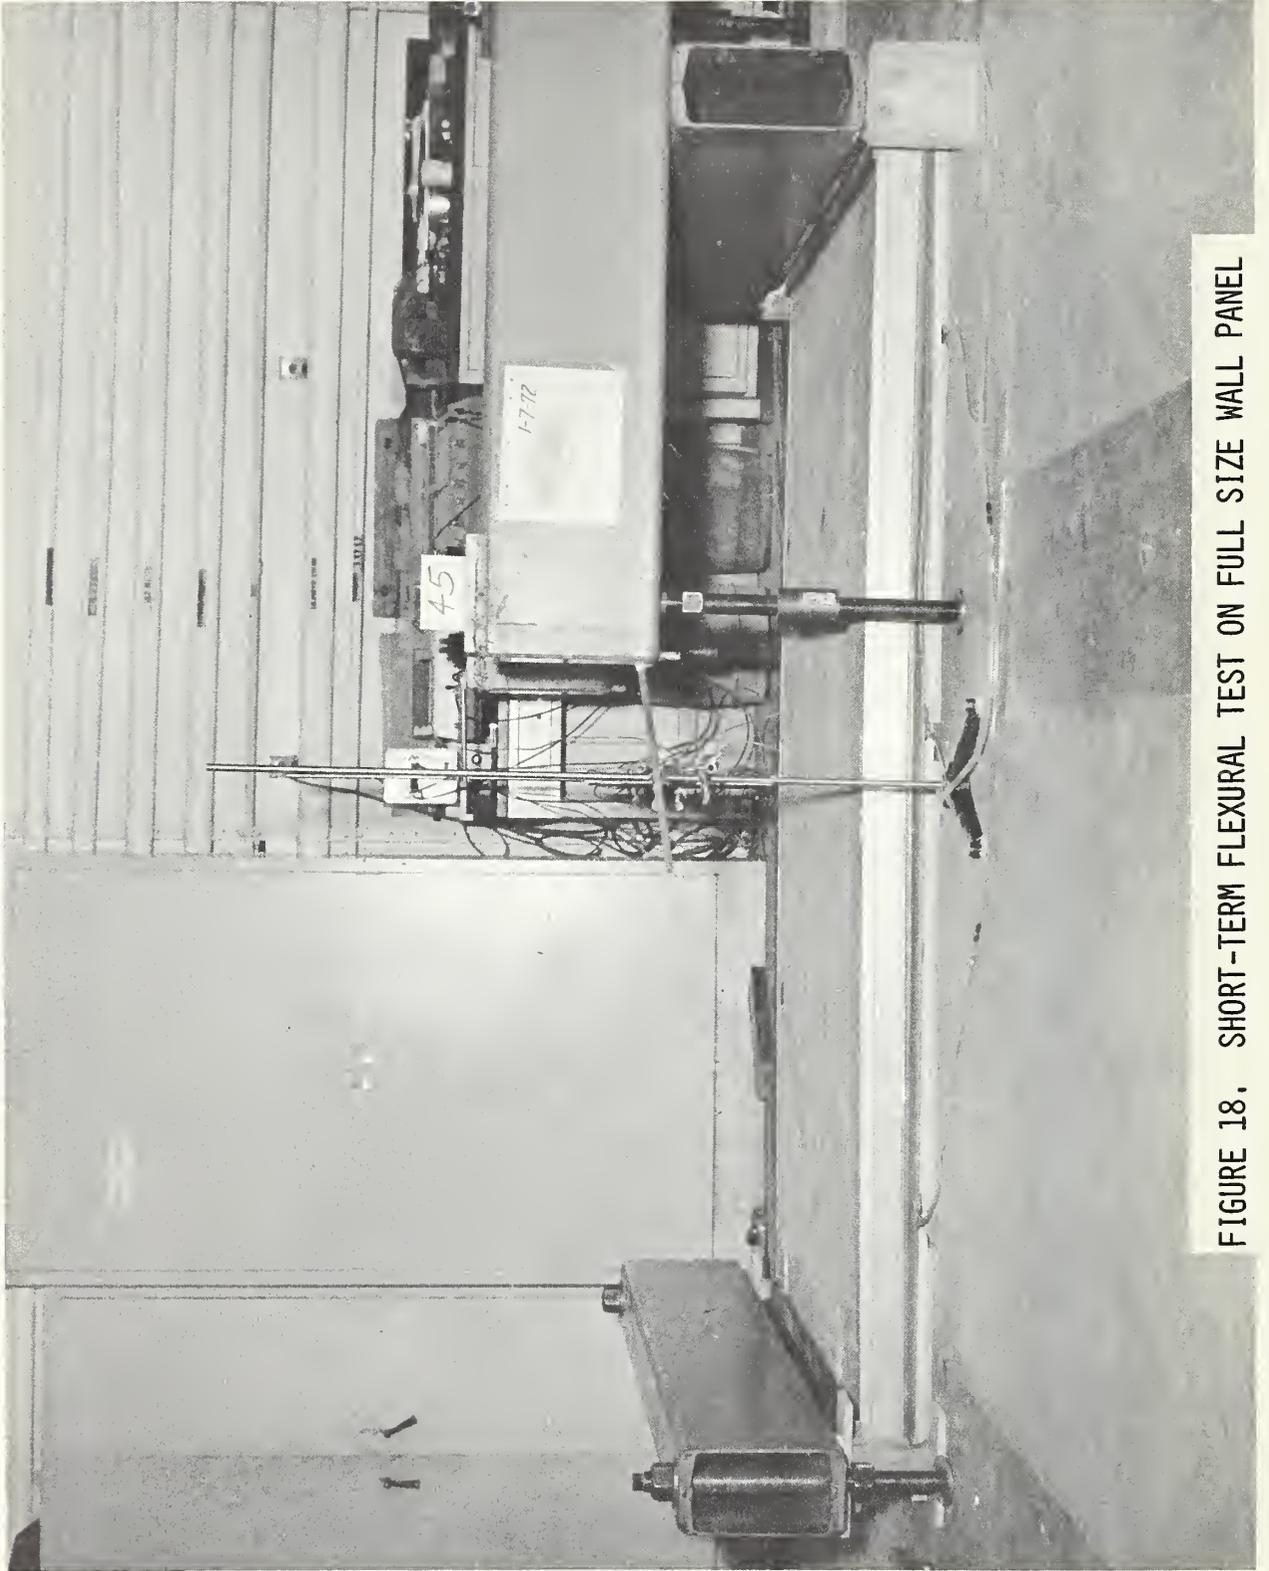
SHORT-TERM FLEXURAL TEST ON FULL SIZE WALL PANEL
